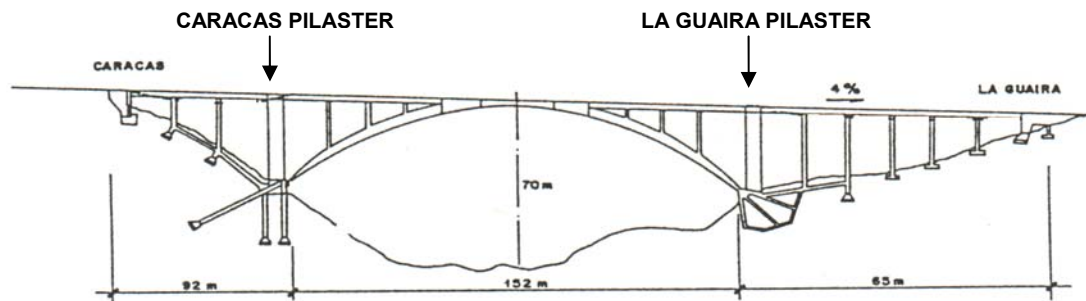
Longitudinal section of Viaduct No. 1. Note different type of foundations for the Caracas Pilaster and La Guaira Pilaster.
